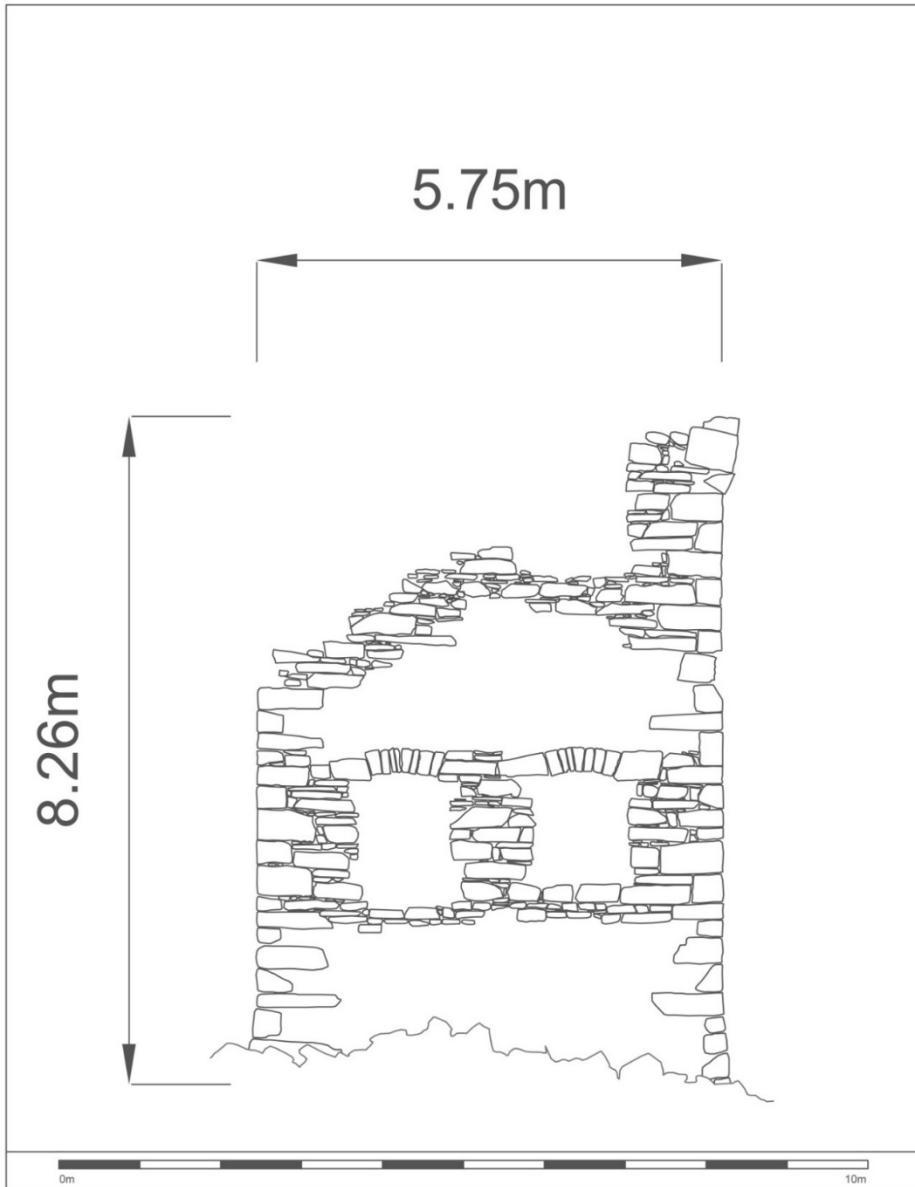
External elevation of the north wall of Clare Island Signal Tower.
